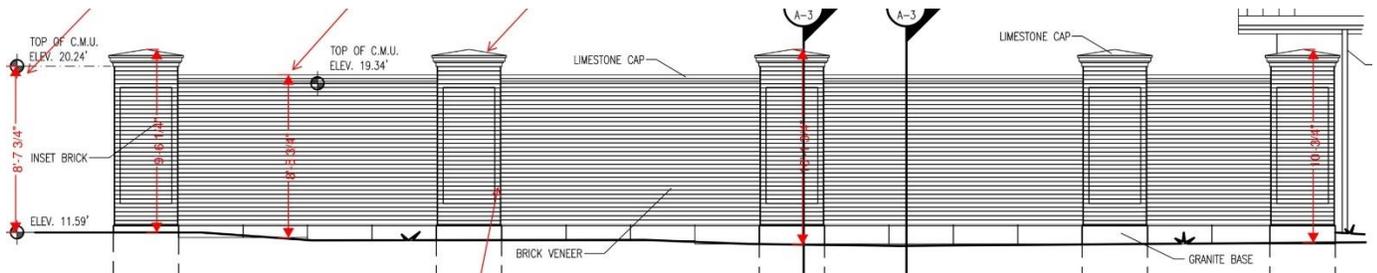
Diagram of proposed wall. Heights in red from L to R: 8'7 3/4"; 9'6 1/4"; 8'5 3/4"; 10'1 3/4"; 10' 3/4"
